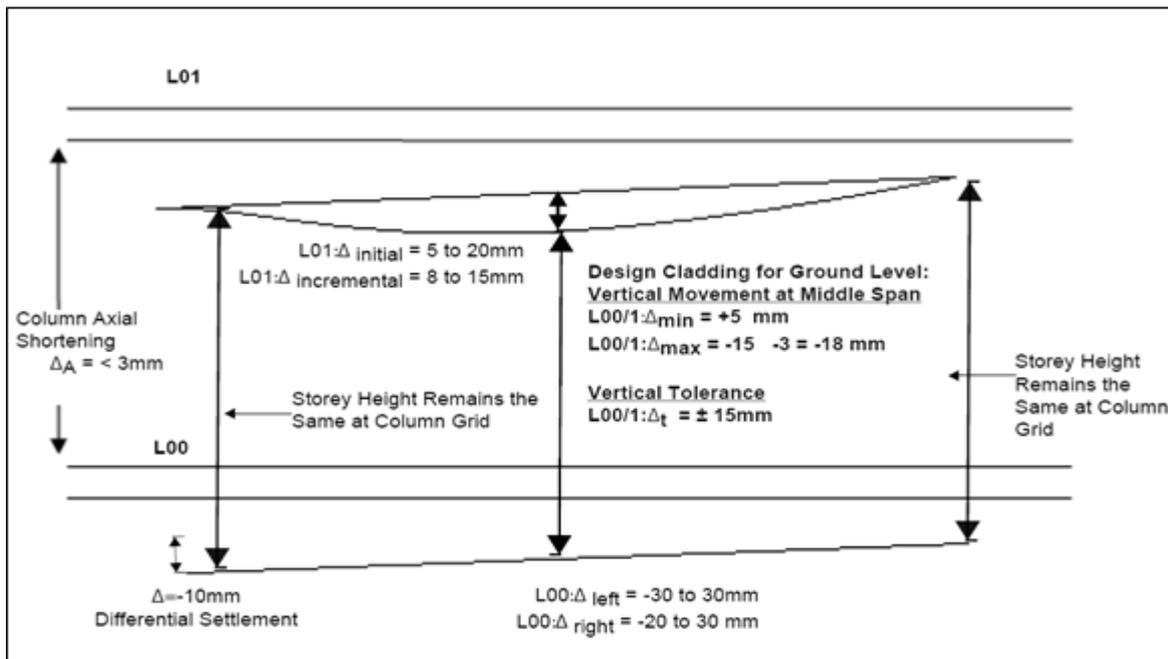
Ground Floor - Slab Edge Condition, (Robert Bird Group)
